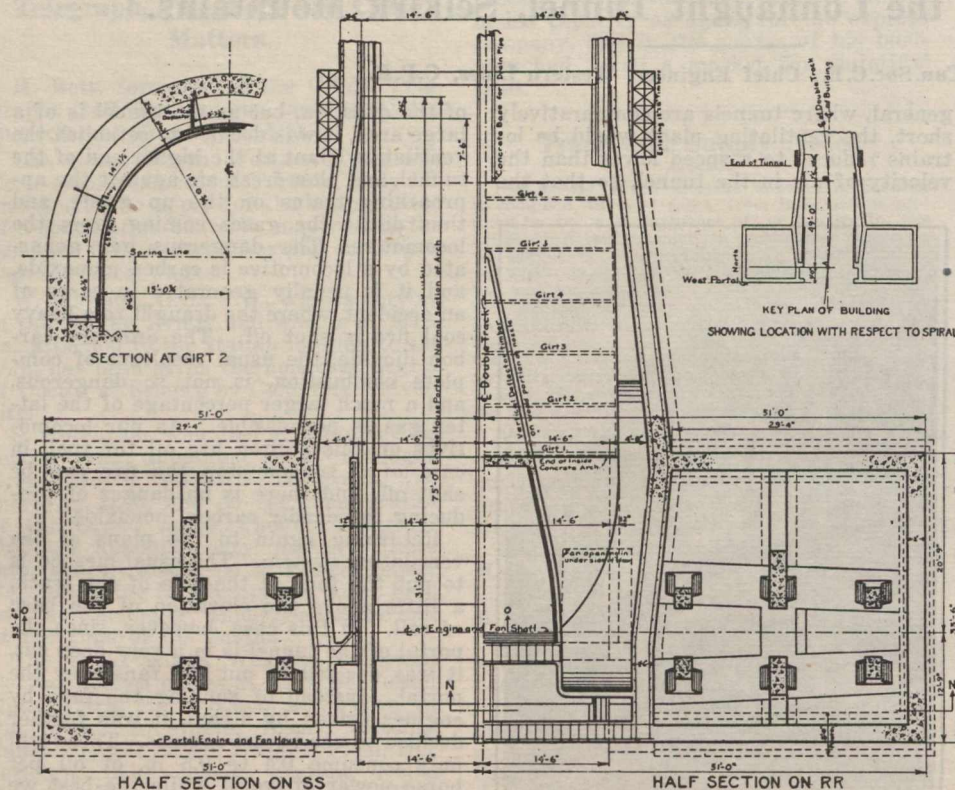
Connaught Tunnel Ventilation, Sectional Plan.
